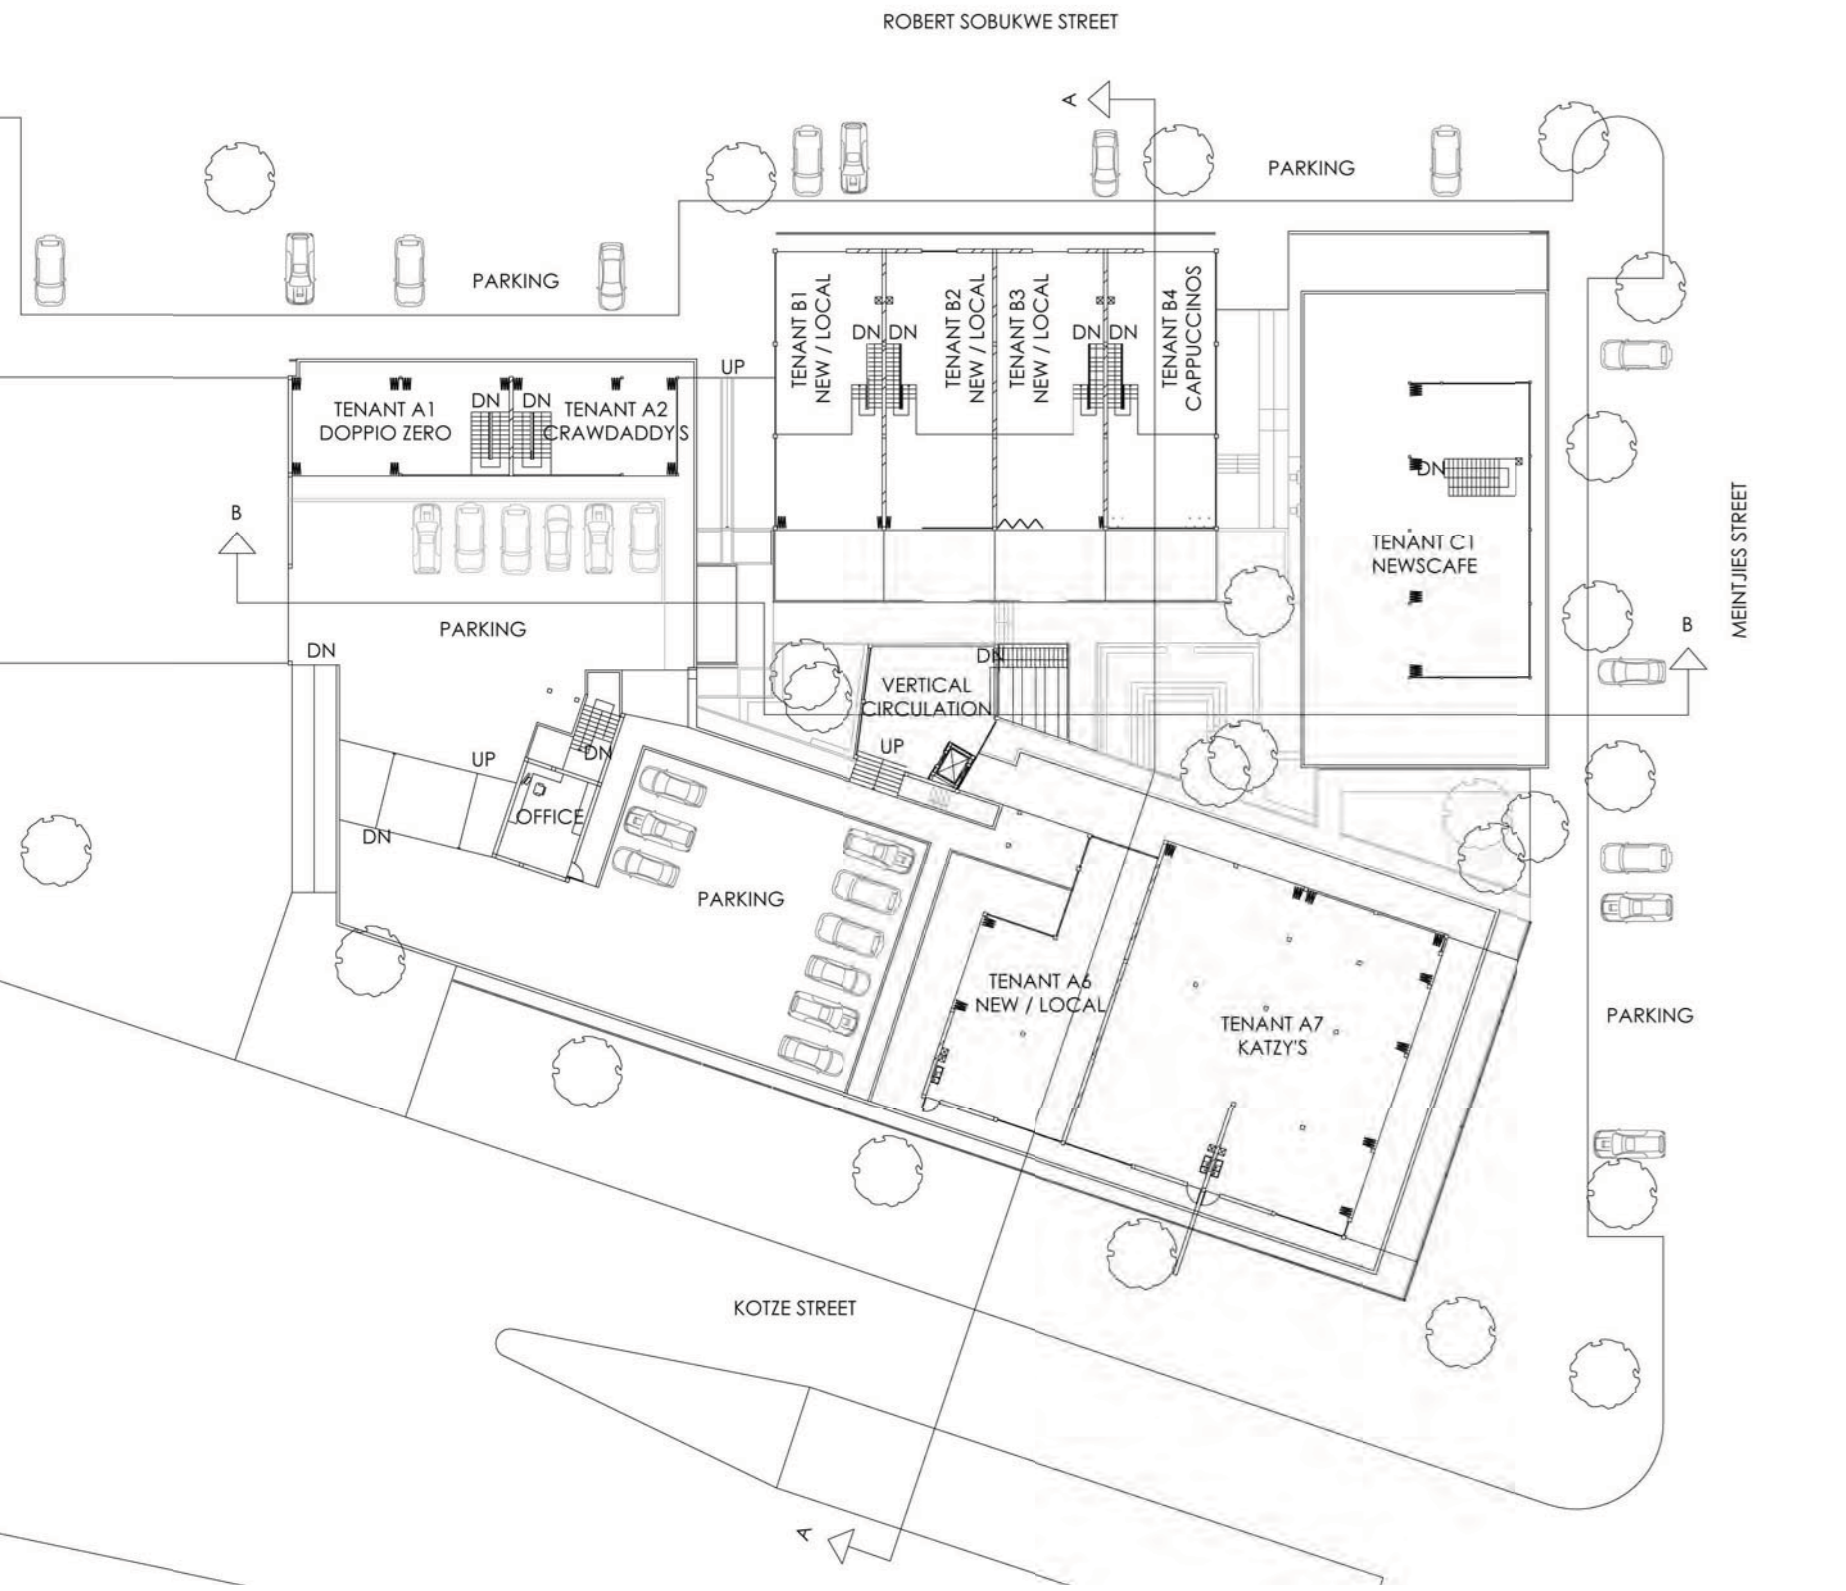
Additions First Floor Plan Scale 1:500
